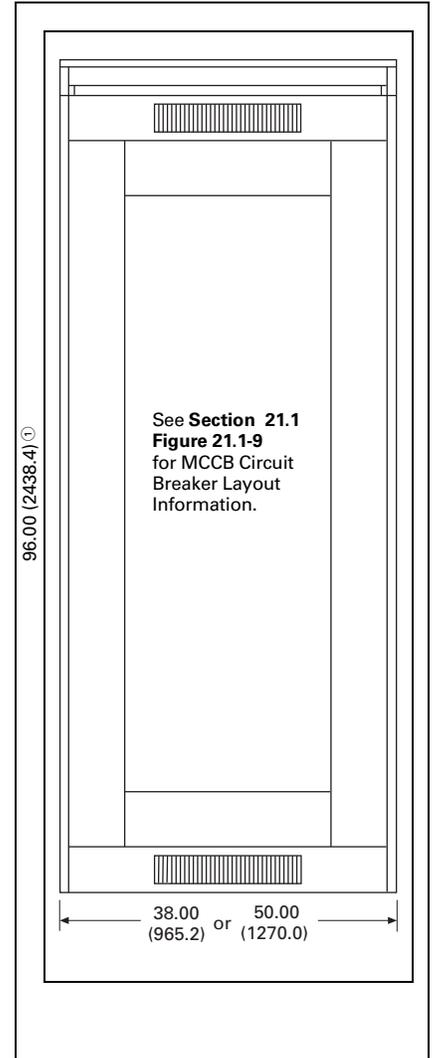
Group-Mounted Molded Case Circuit Breaker Switchboard
